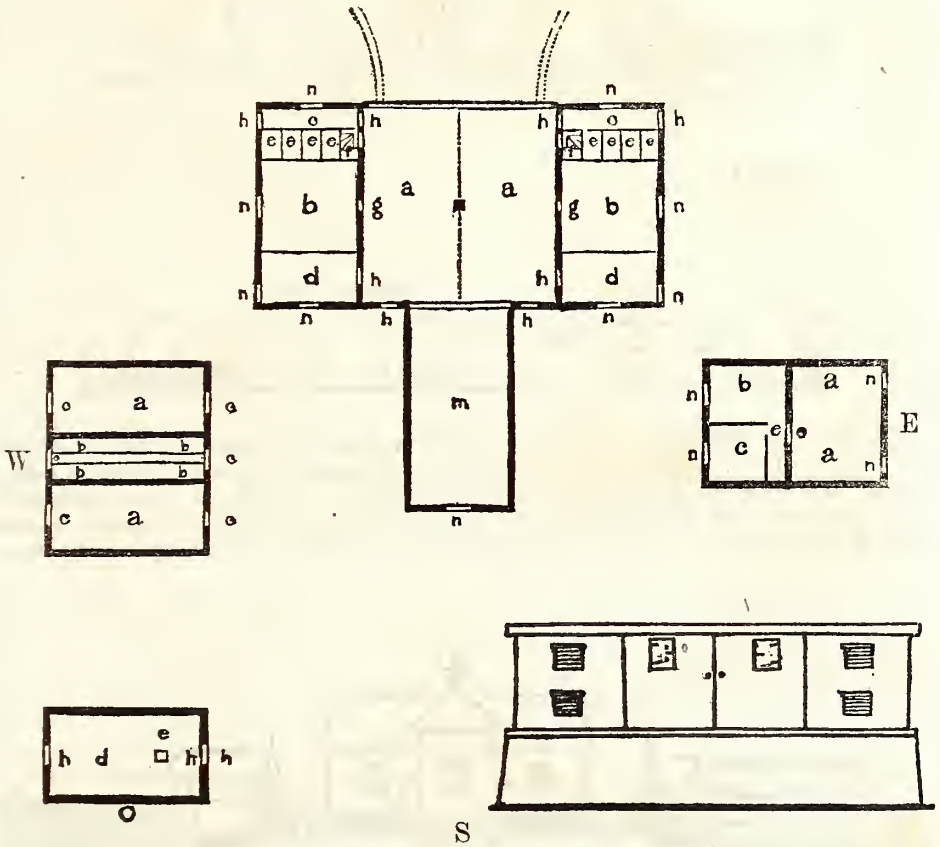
second floor of the buildings on the north, east and west sides of the court, N, second floor of the main barn; a, a, threshing floors, each 20 x 40 feet; b, b, bays or mows for grains 20 x 20; d, d, rooms for chaff 10 x 20, with tubes 1 1/2 feet square in the floor of each, and of sufficient length to extend into the mangers of the cow and ox stables in the basement story; c, c, granaries, one for wheat, the other for rye and oats, 10 x 20, each divided into four garner e, e, e, e, 4 x 6; f, f, stairway to basement; h, h, doors; n, n, windows; g, g, ladder to mows. The large doors to the main barn are balanced upon rollers of iron which revolve freely upon an iron guide rail, and are opened by pushing them to the right and left; a small door 3 x 6 is hung with hinges into each of the large
